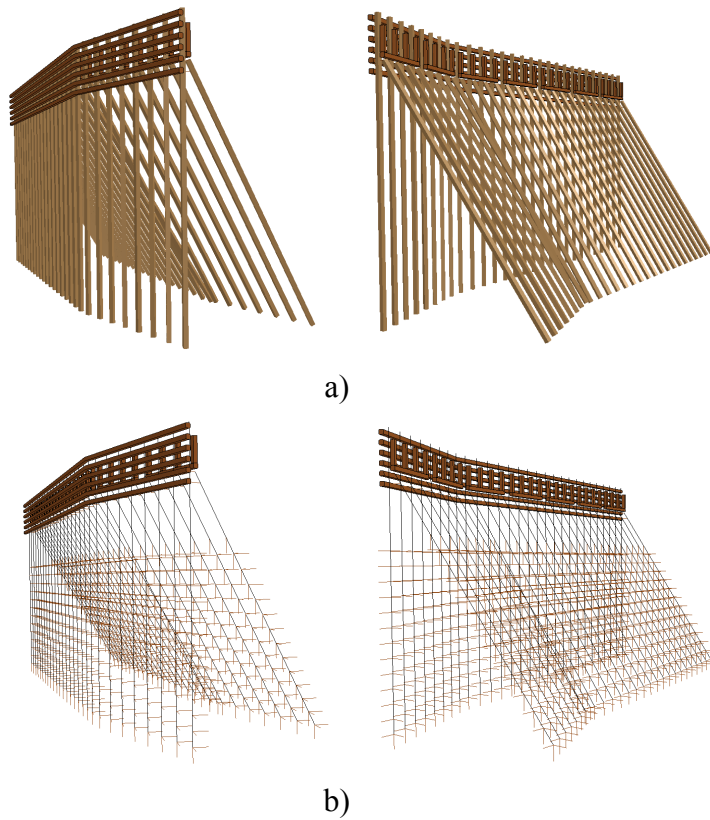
Isometric views of the complete flexible timber guide wall finite element model:
